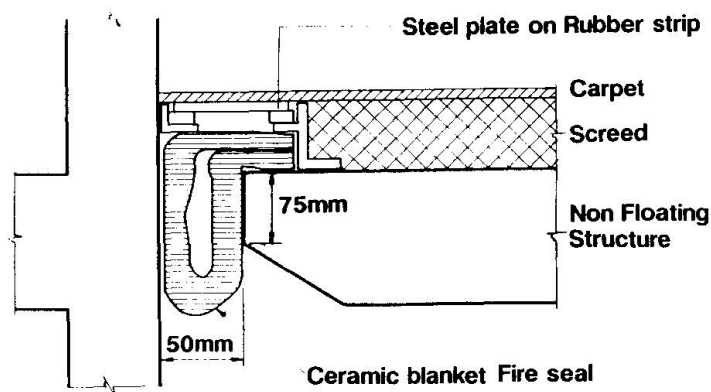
Railway vibration joint: isolation gaps separate all halls.
